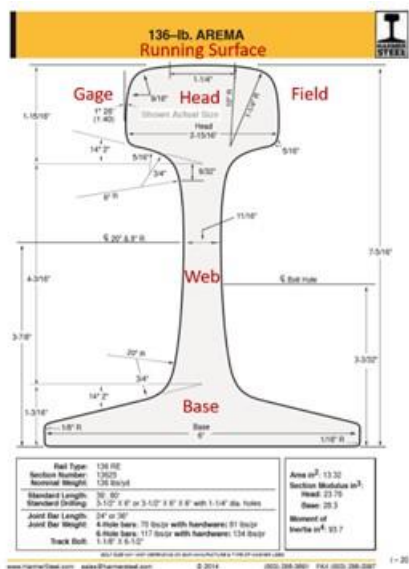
136lb/yd AREMA Rail Cross section from Harmer Steel with annotations [15]
